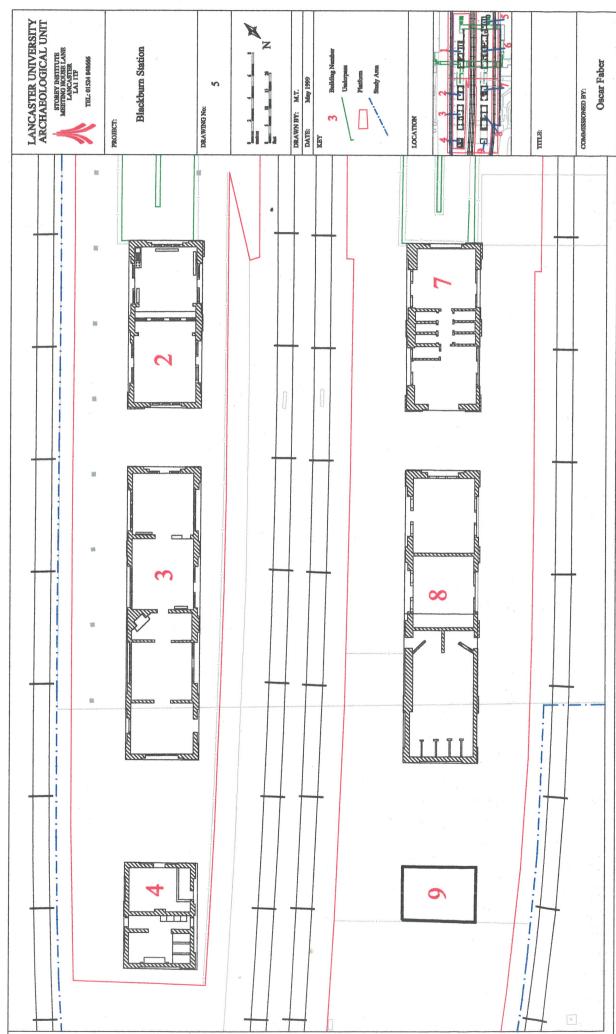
Station North End, Platform Level Plan - Buildings 2,3,4,7,8 and 9
